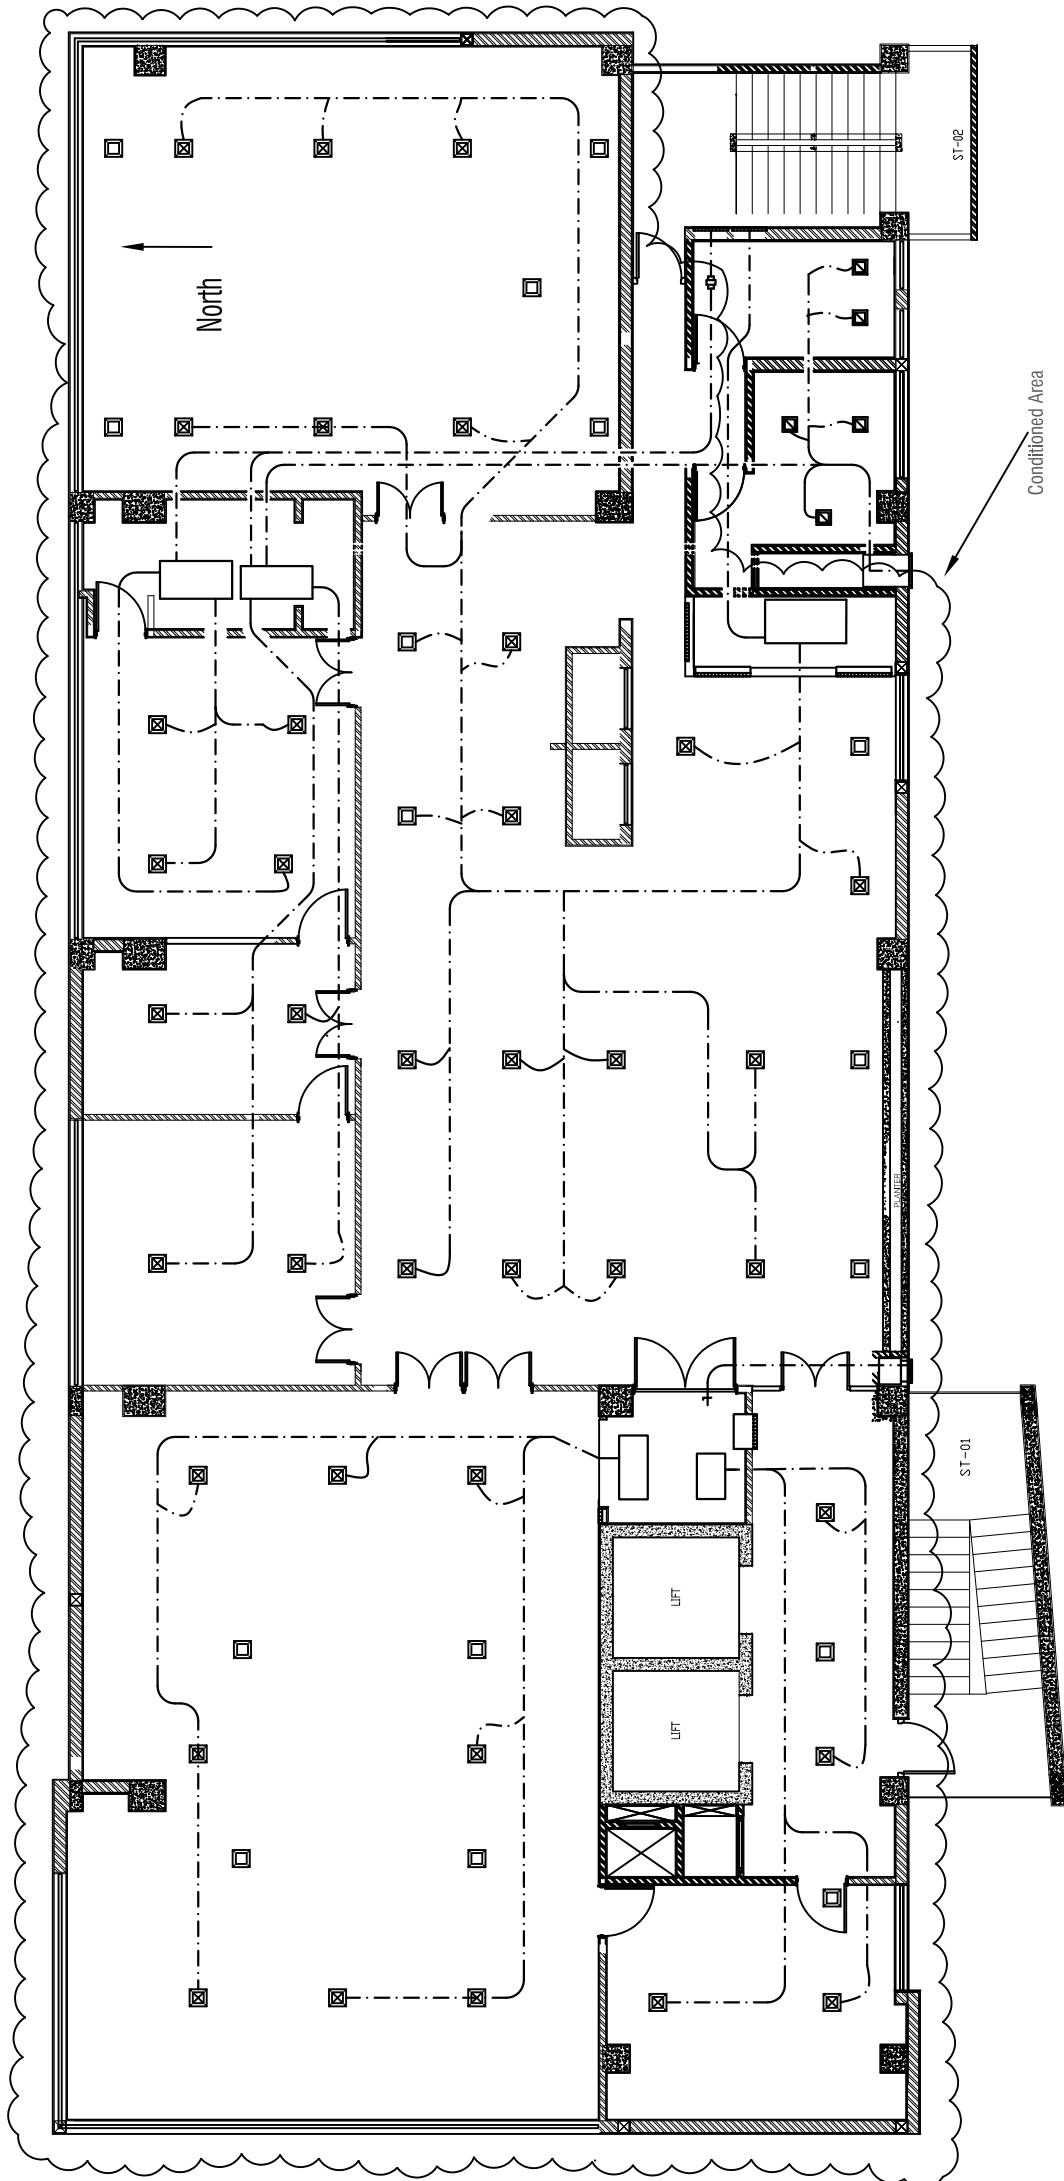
Ceylinco Life Insurance Building - Seventh Floor
